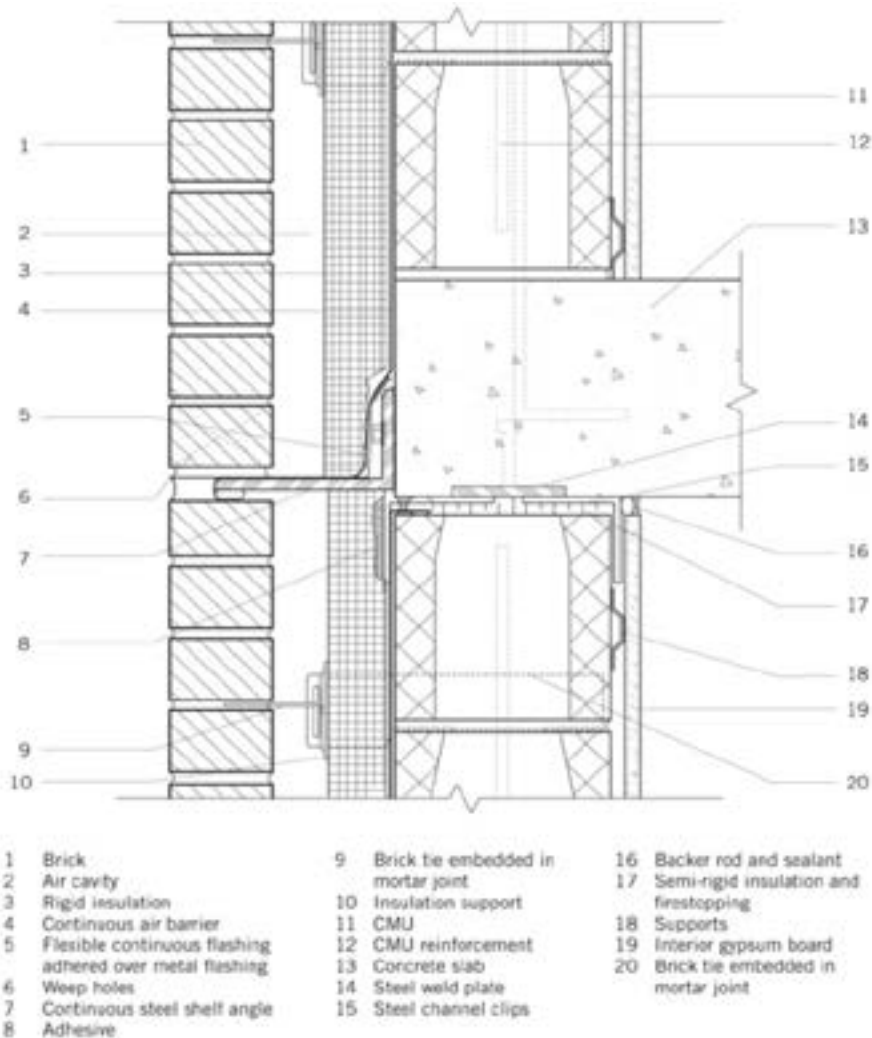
Masonry facade (Brick, hollow, frame, steel stud wall)
